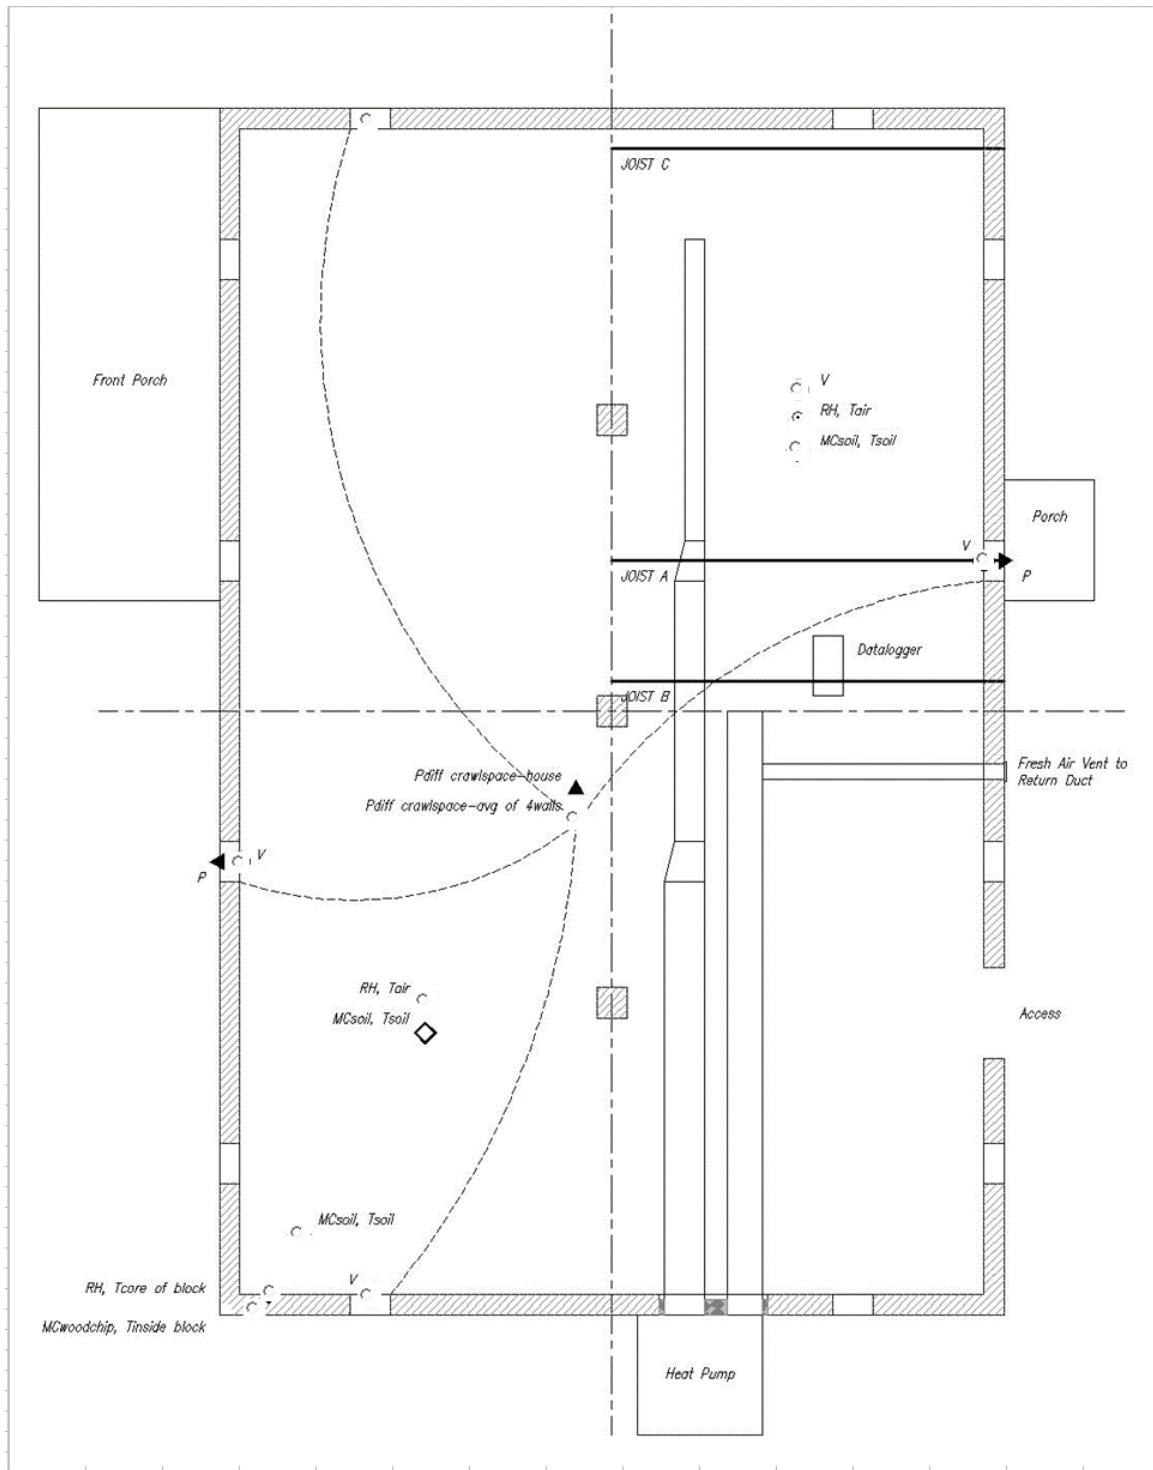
Measurement locations in the floor plan of the vented crawlspace house.
